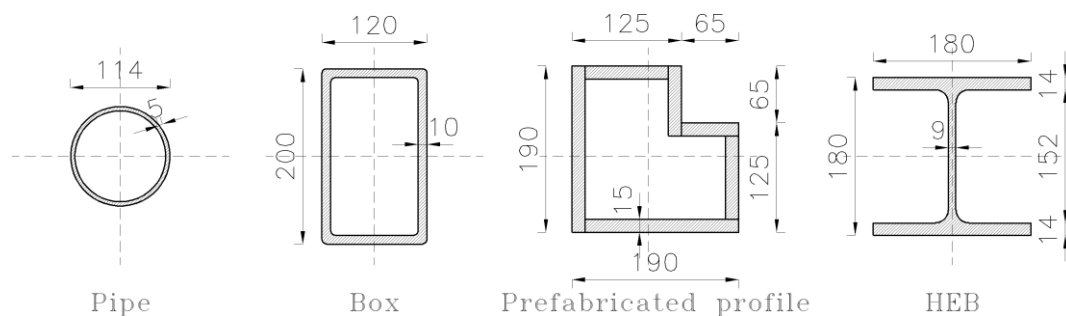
Cross-section of the elements used for the numerical modeling (mm).
